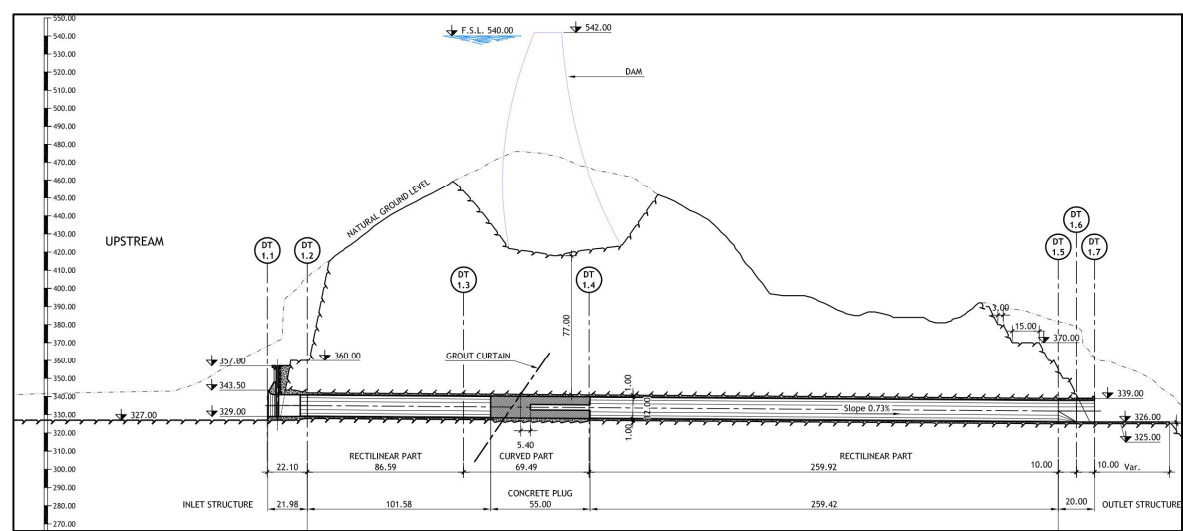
Diversion tunnels – Longitudinal Section (DT1)
